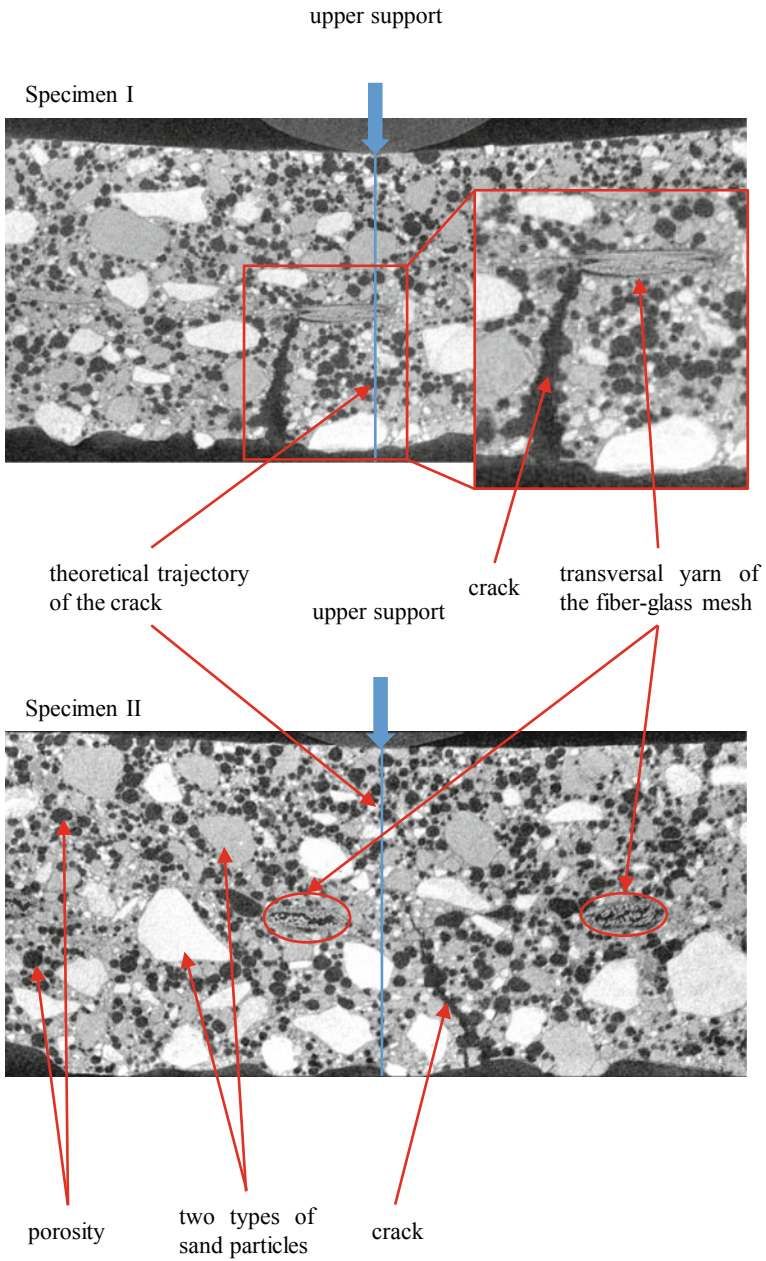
Vertical sections inside the reconstructed 3D volumes of cracked specimens I and II
